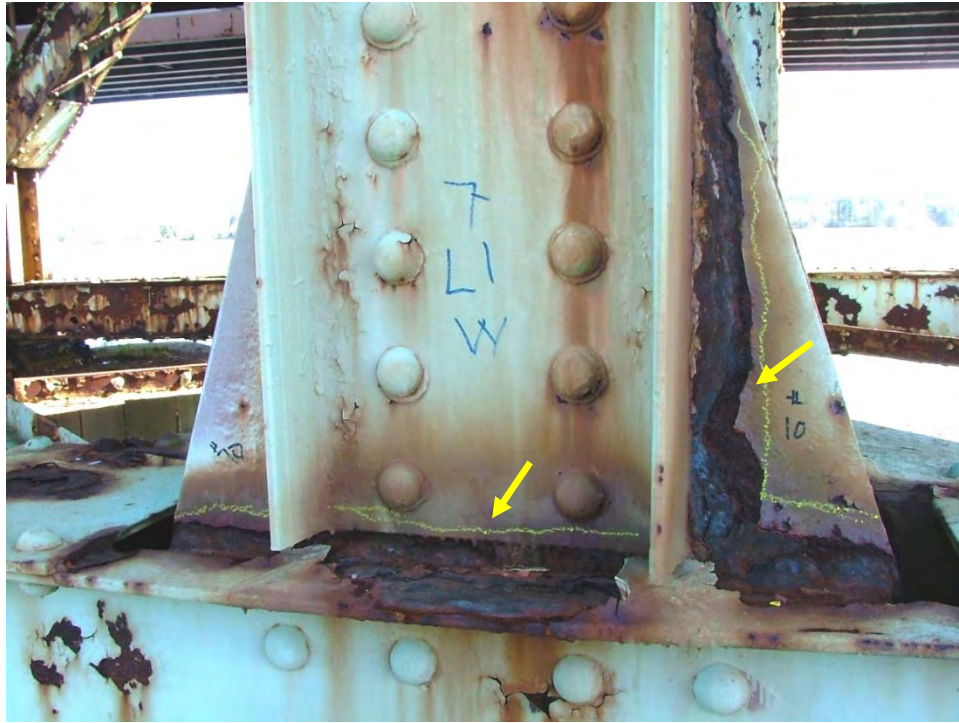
Span 7, lower gusset plate at L1 on west truss. Heavy loss along the top of the bottom chord adjacent to vertical member.
